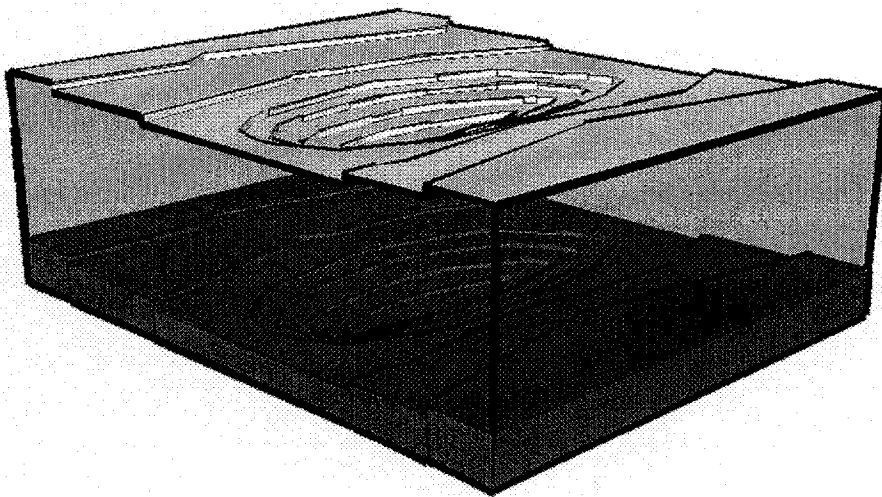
Exhibit A – an example of a site with a depression (topographic low-point) in the center of the site. The volume represents the allowable building envelope created by the measurement technique currently applied in South Lake Union.
